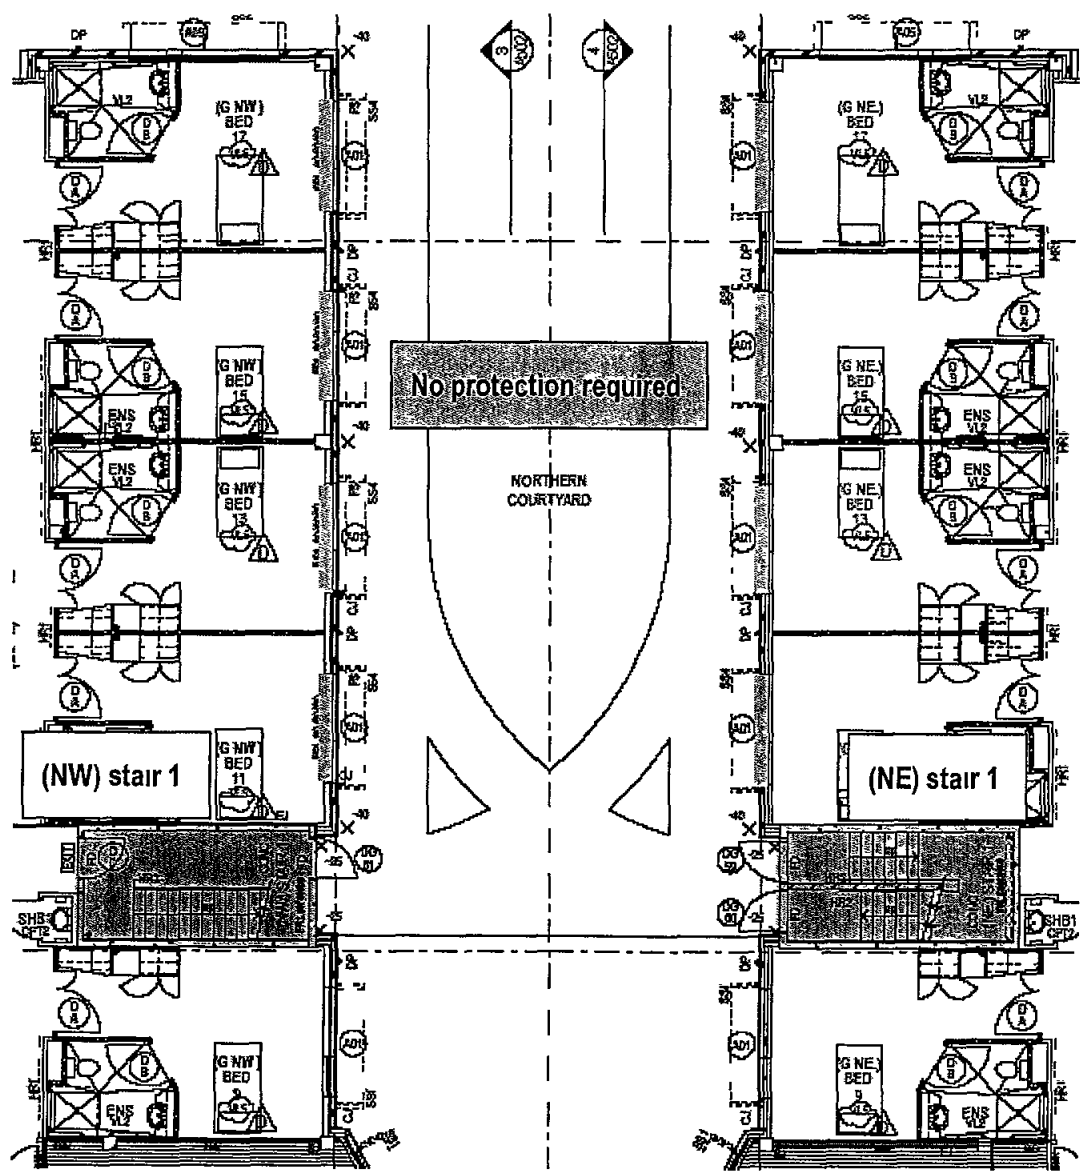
Discharge from (NW) stair 1 and (NE) stair 1
